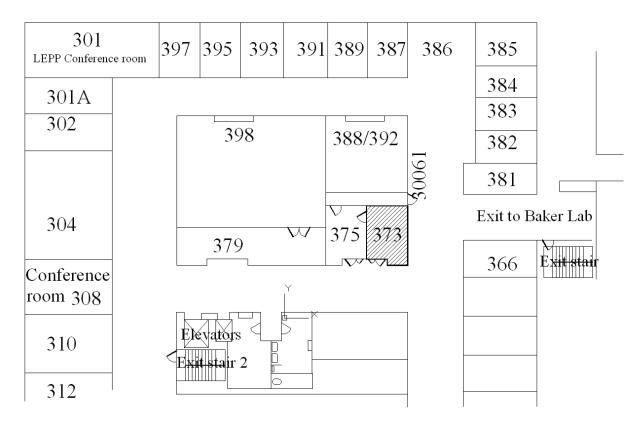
The third floor PSB General plan. Room 373 is hatched.
